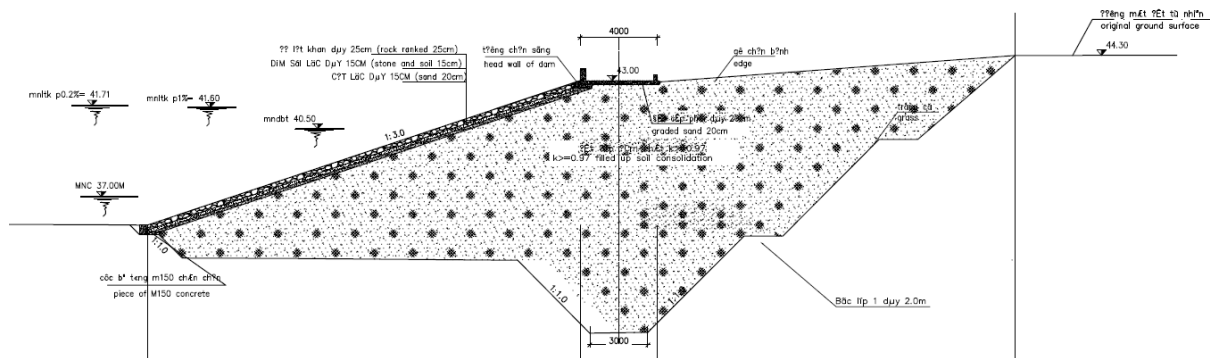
Cross Section of Stone Masonry Wall with Slope
